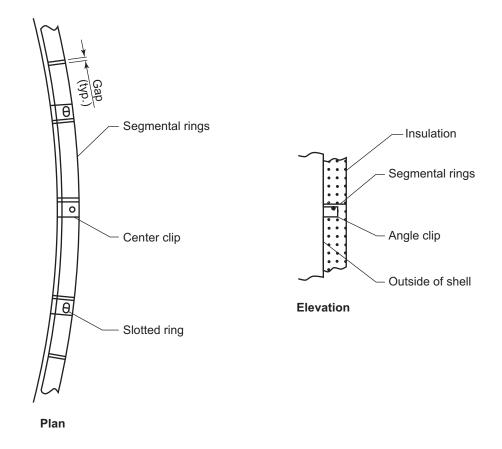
Insulation Support System with Clips Welded to the Shell With Segmented Rings Connected to the Clips by Bolts
